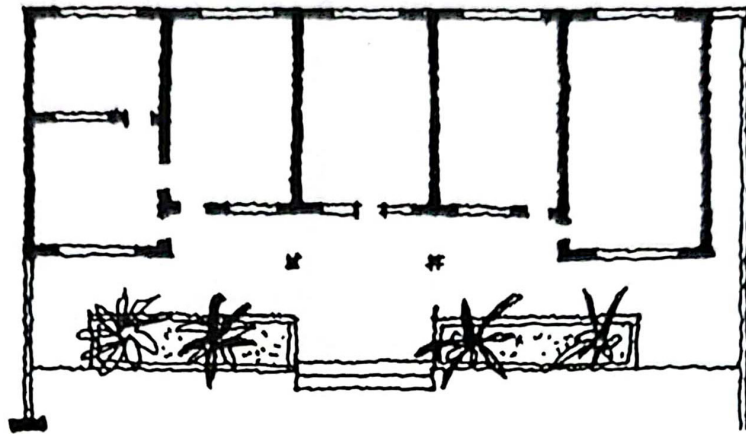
Floor plan of an example “Tiger-hugs-the-head” style house.⁴⁹
